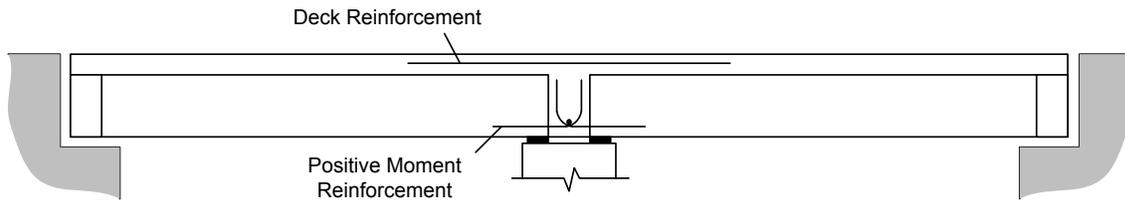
Precast, prestressed girders connected with live load continuity.
